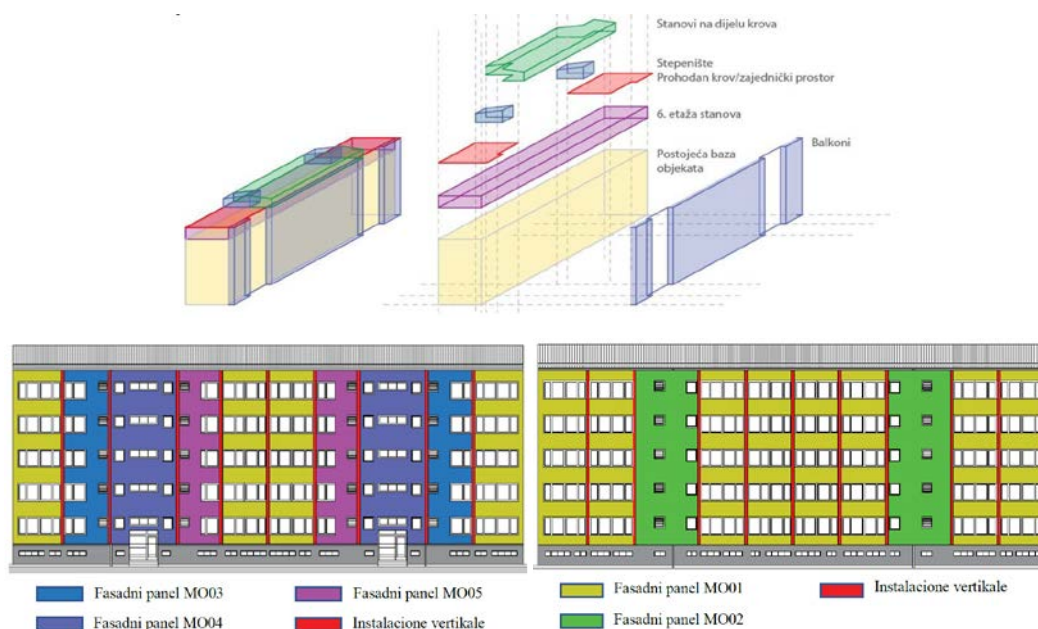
Sample 1 – Design for the renovation of the building envelope [32]
